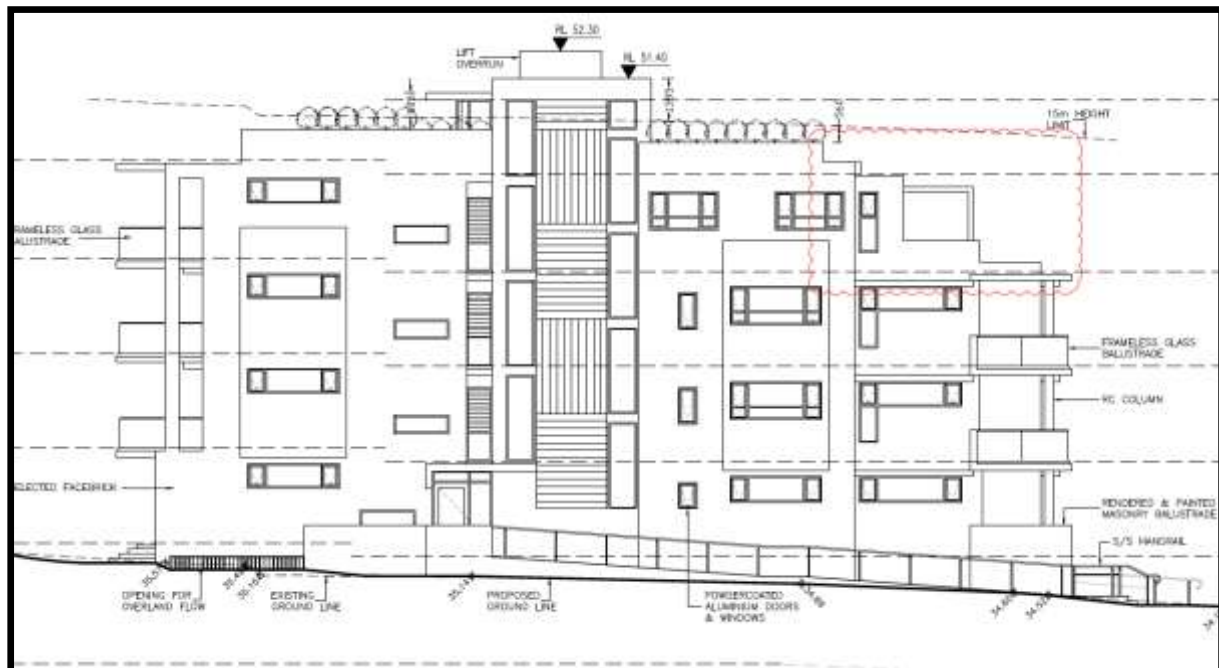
Amended North-western elevation (Courtesy: Cornerstone, March 2020)
